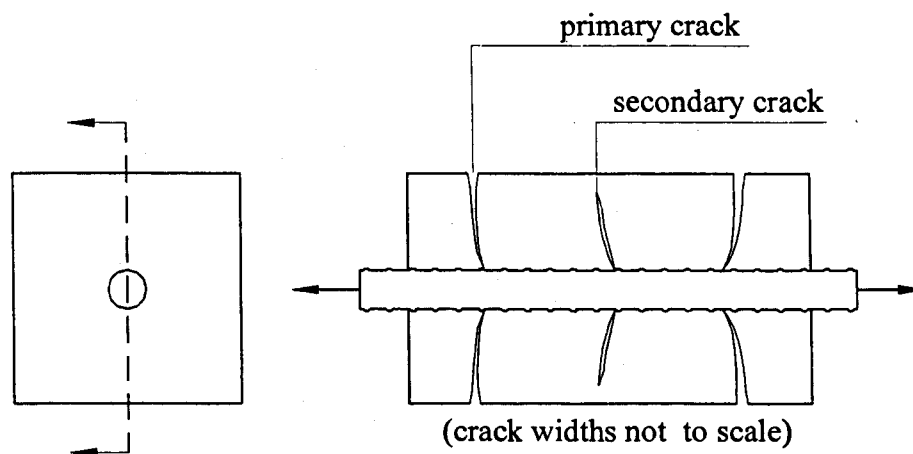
Primary and Secondary Cracks in a Reinforced Concrete Member in Tension [ACI, 1986]
